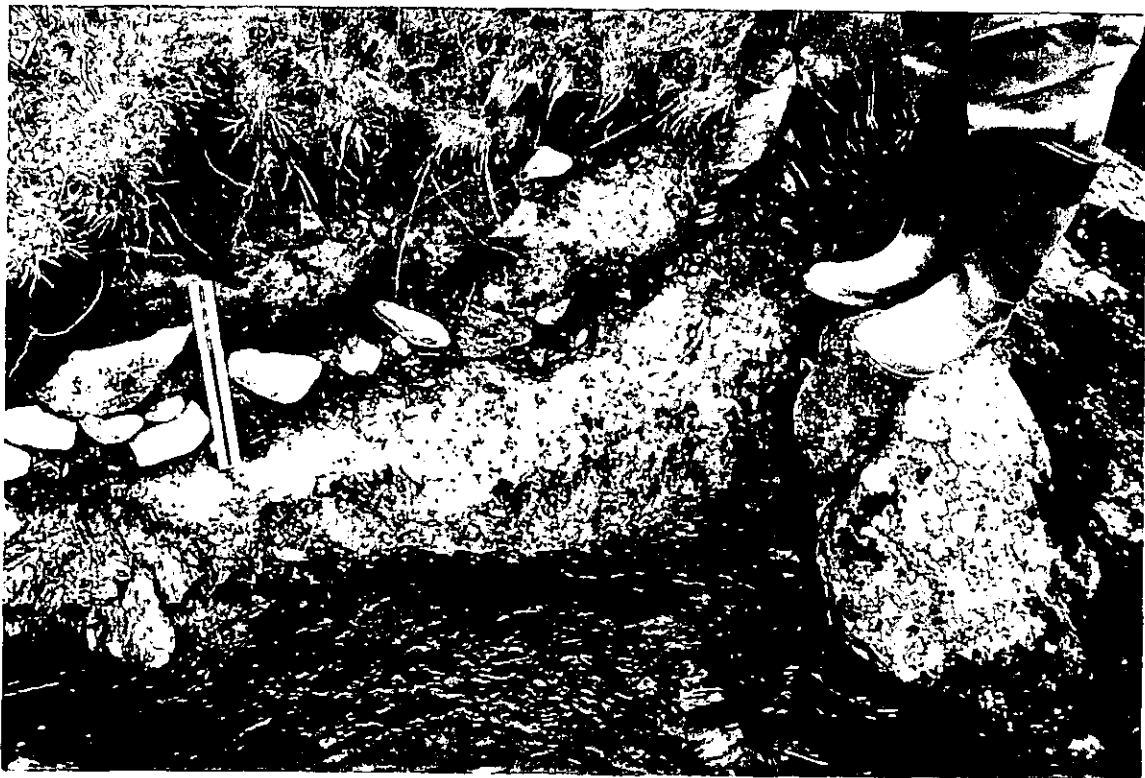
SECTION I. Overburden exposed along riverbank close to proposed intake.
